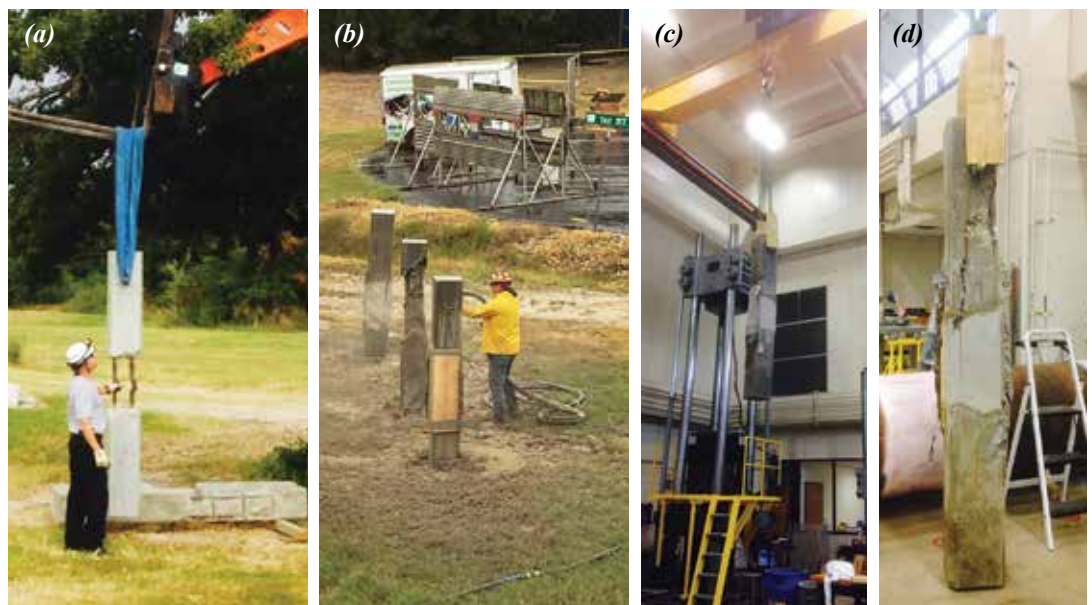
Disaster City demonstration: (a) placement of damaged vertical beams into ground; (b) shotcrete repair of damaged beams; (c) compression testing of repaired beams; and (d) repaired beam after compression testing, showing that beam failed outside of repaired section
